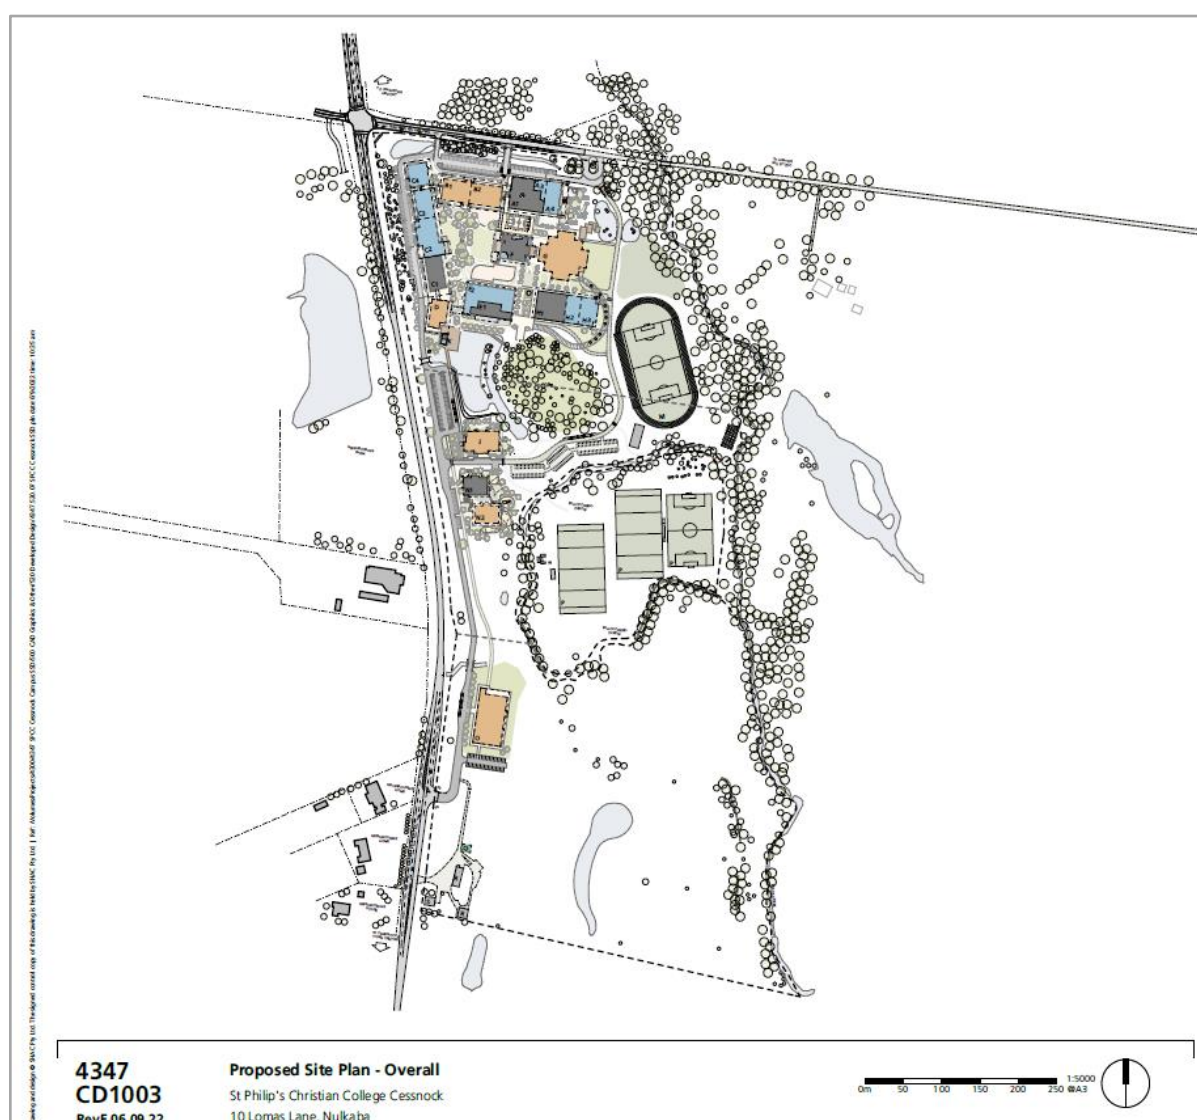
Proposed Site Plan – Overall. Refer to Appendix A for plans of the proposal.
